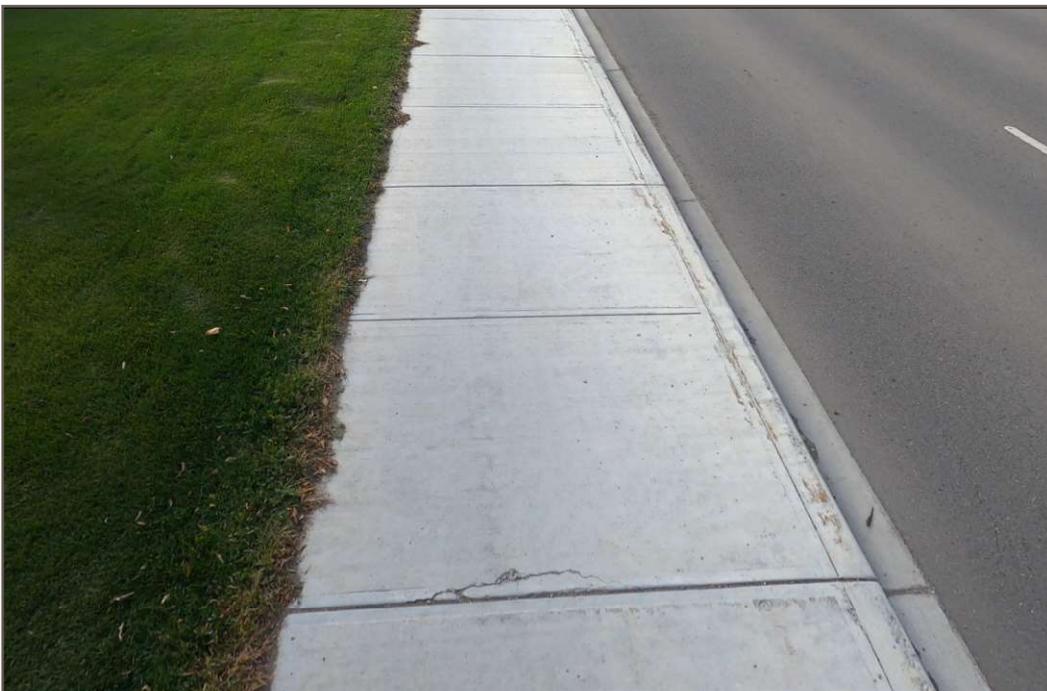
111 Avenue, August 2020: Concrete cracking on sidewalk panel.
